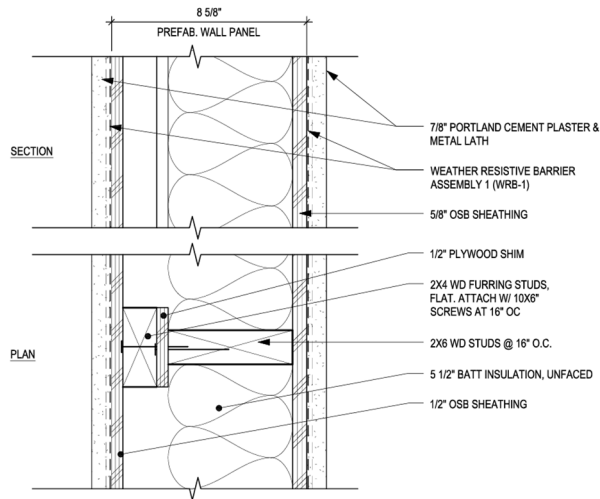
Typical exterior wall construction assembly based on Frog building design
